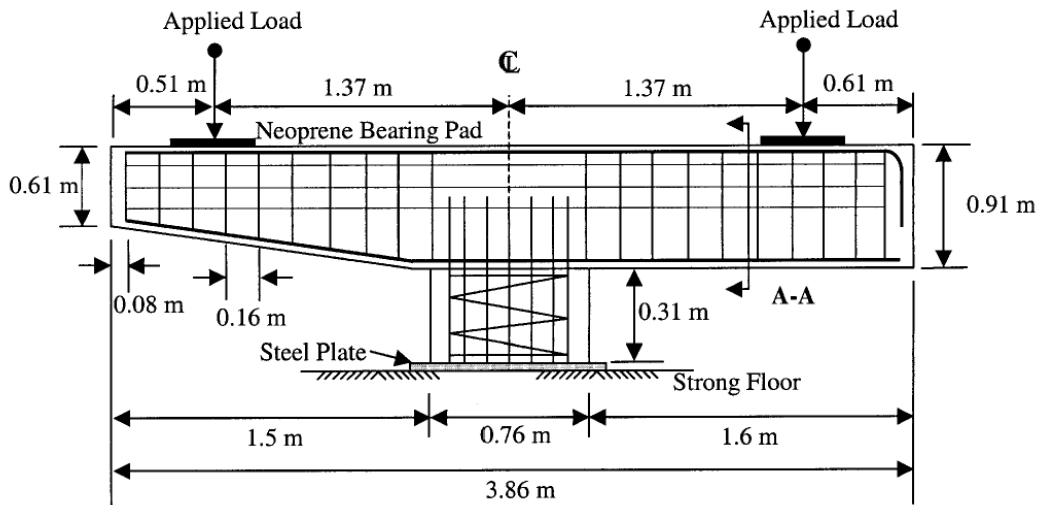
Typical bent cap specimen (Young et al., 2002)
